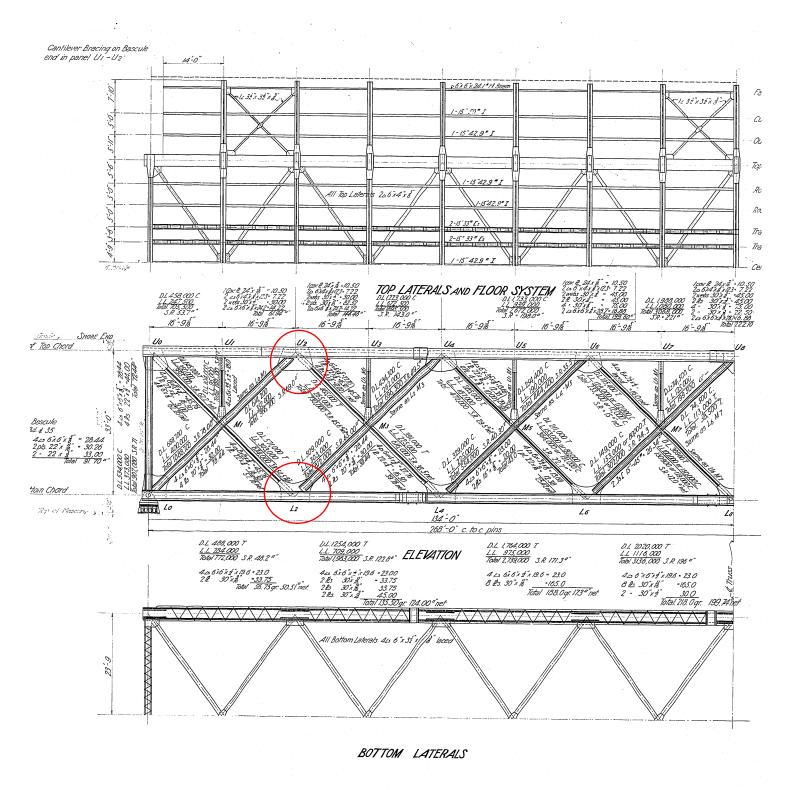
Burnside Bridge Fixed Spans - Truss System Connections as Shown
